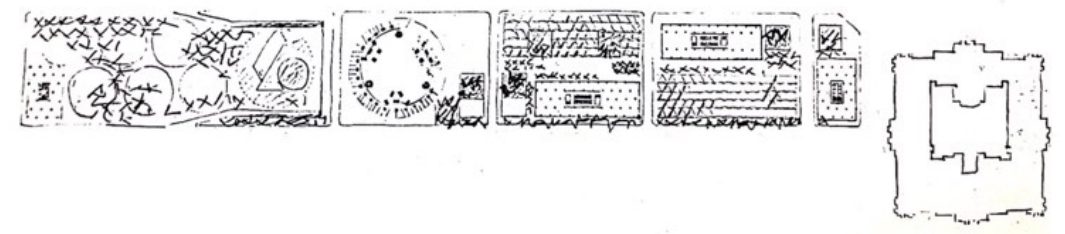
L. Kahn's hand drawing showing the alternate esplanade plan, next to the existing City Hall (far right). (Brownlee & De Long, 1991, p. 308)
